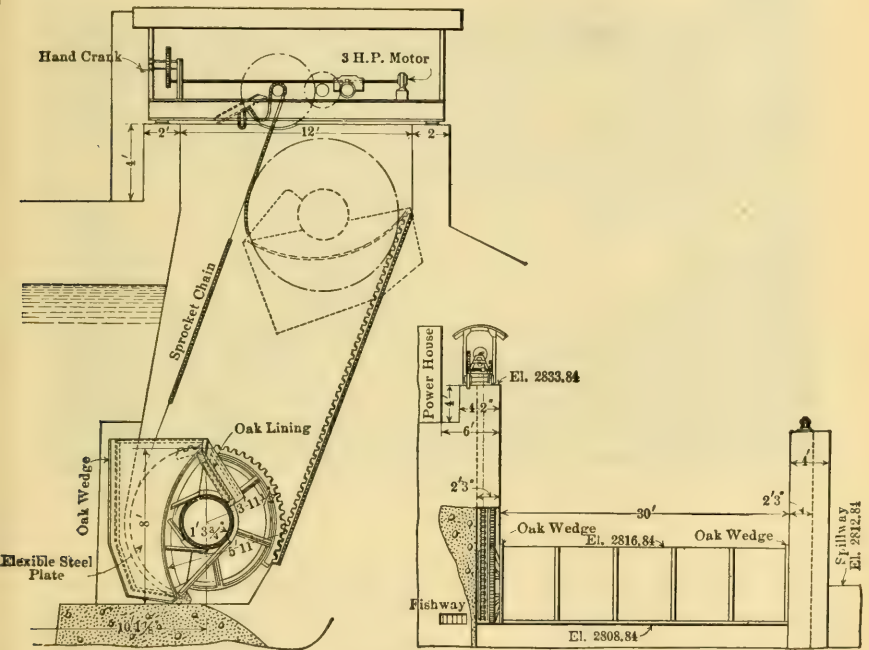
Details of Boise Roller Dam, Showing the General Arrangement.
